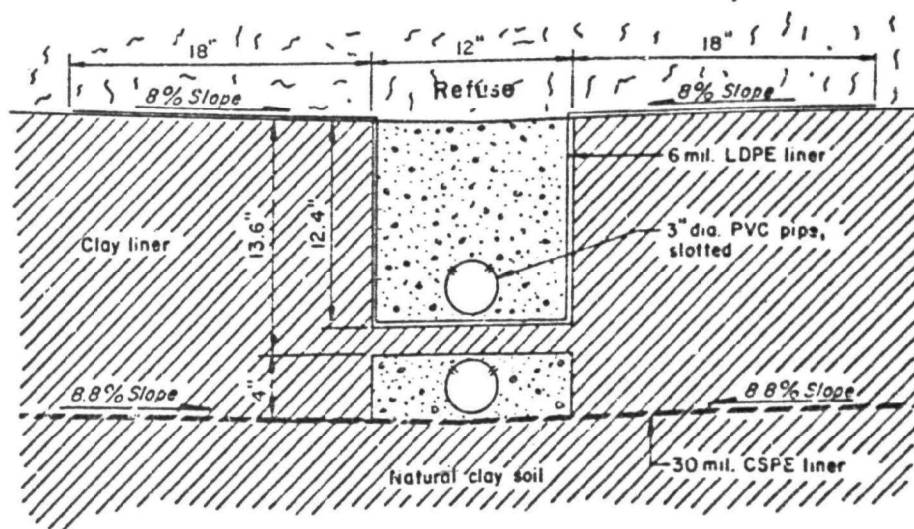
Cross Section of TC-1 at Observation Bulkhead
